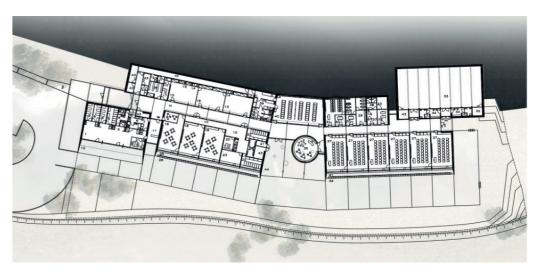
Floorplan, Sun School, RCR architects (2014) • Source: El Croquis
